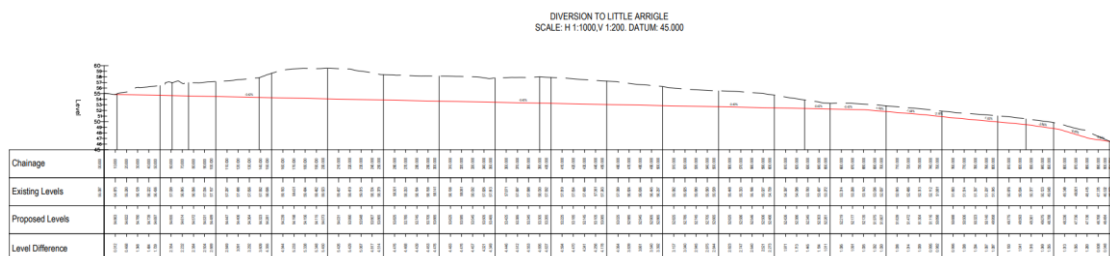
Option B Concept Longitudinal Section showing existing and proposed levels
